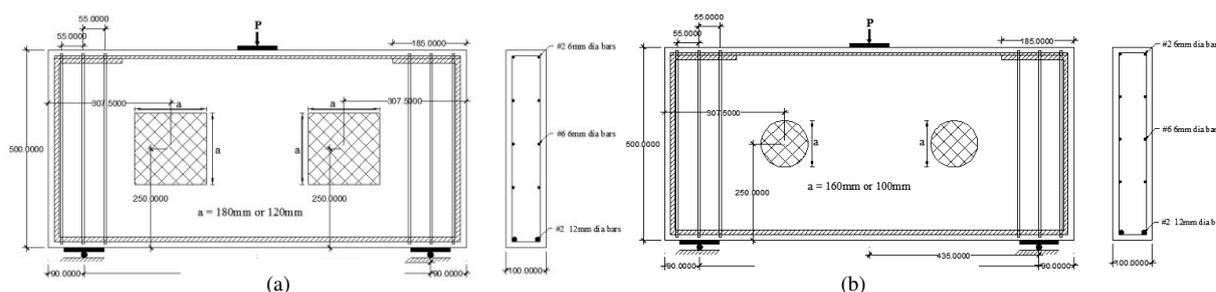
(a) Group A and B beam detailing (units in mm) (b) Group C and D beam detailing (units in mm).
